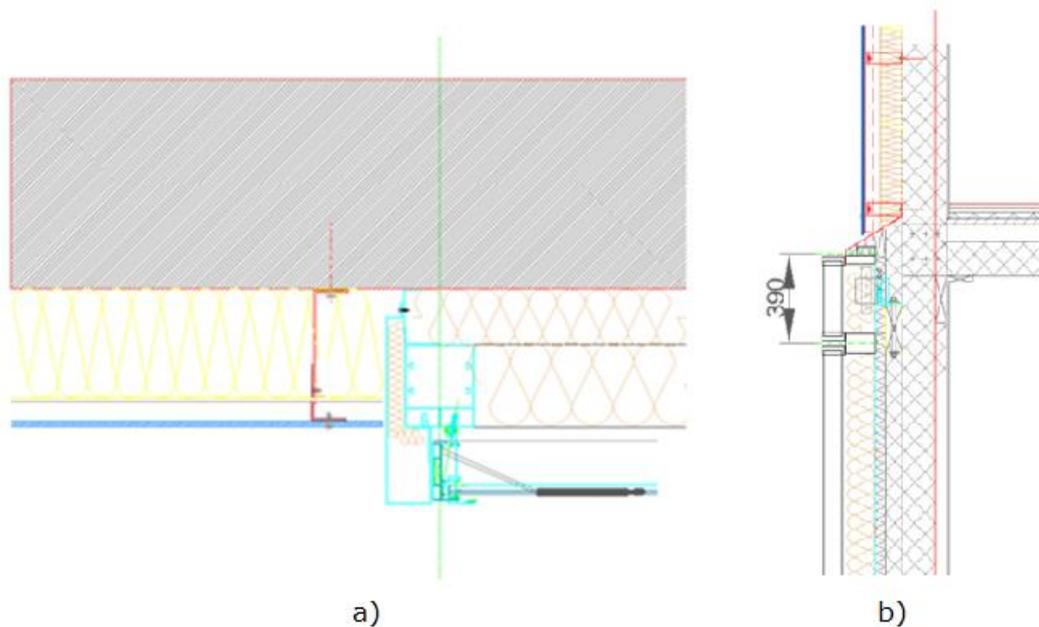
Façade solutions for TARTU demo building: a) south elevation b) east elevation (Source: TRESPA)
